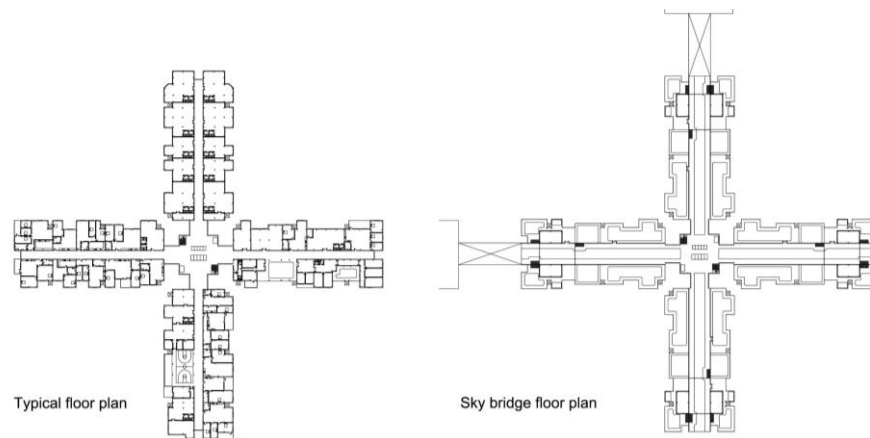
Typical floor plans in the Vertical Dynamic Urbanism complex.
